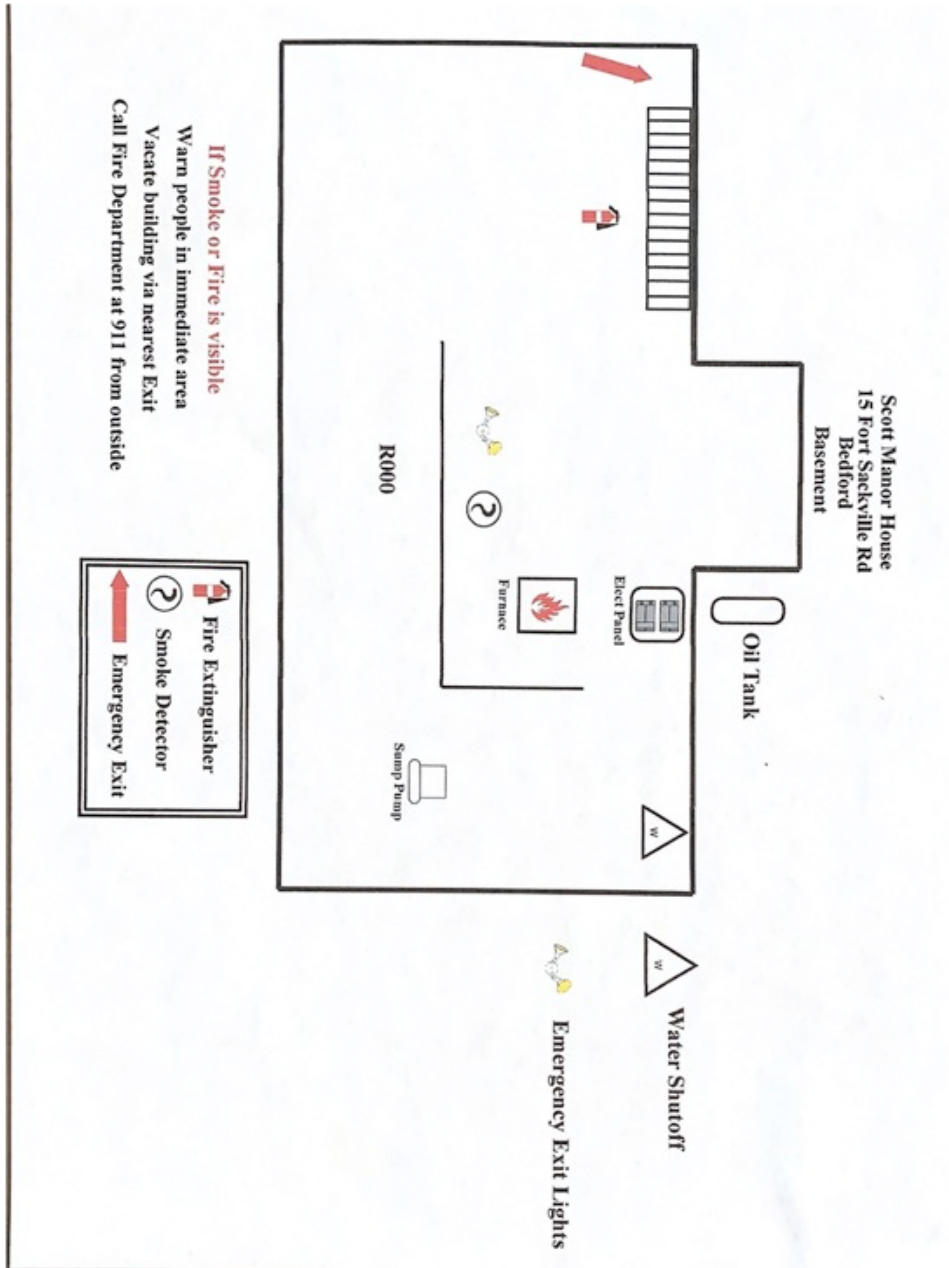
Cellar – Storage and Utilities Spaces
